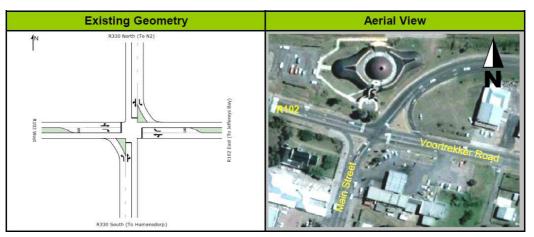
Main Street (R330) / Voortrekker Road (R102) Existing Intersection Geometry
